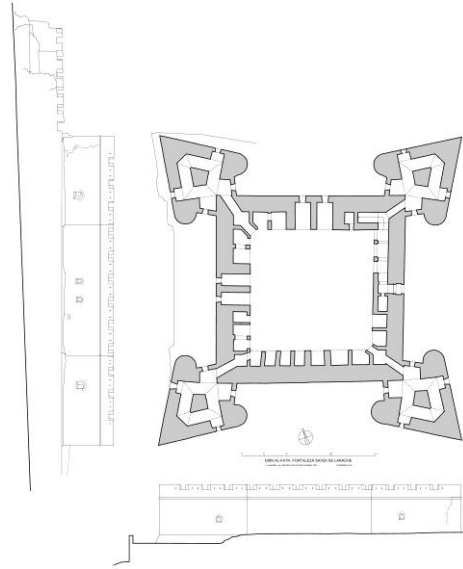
Plan and elevations of Hisn al-Fath in Larache
